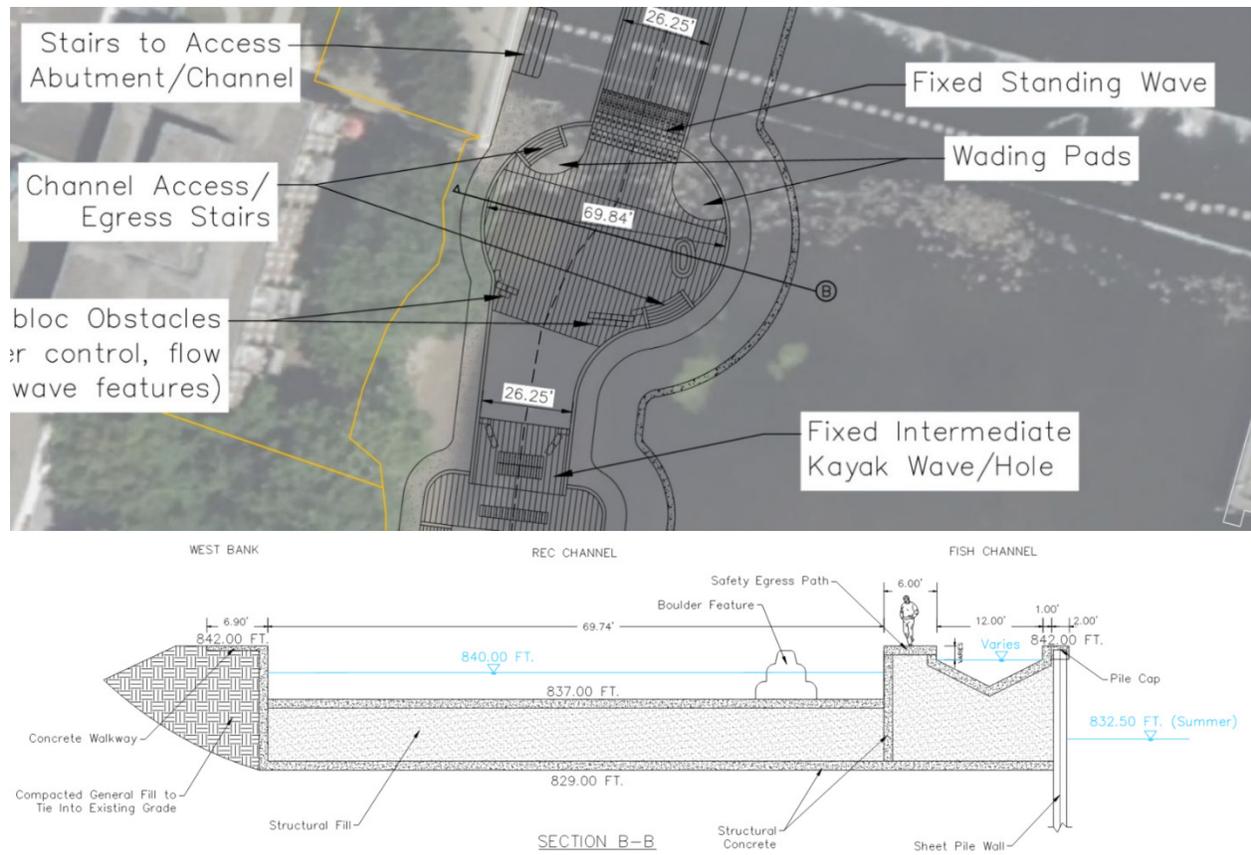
Mid-channel plan and conceptual Section B-B (pool)
